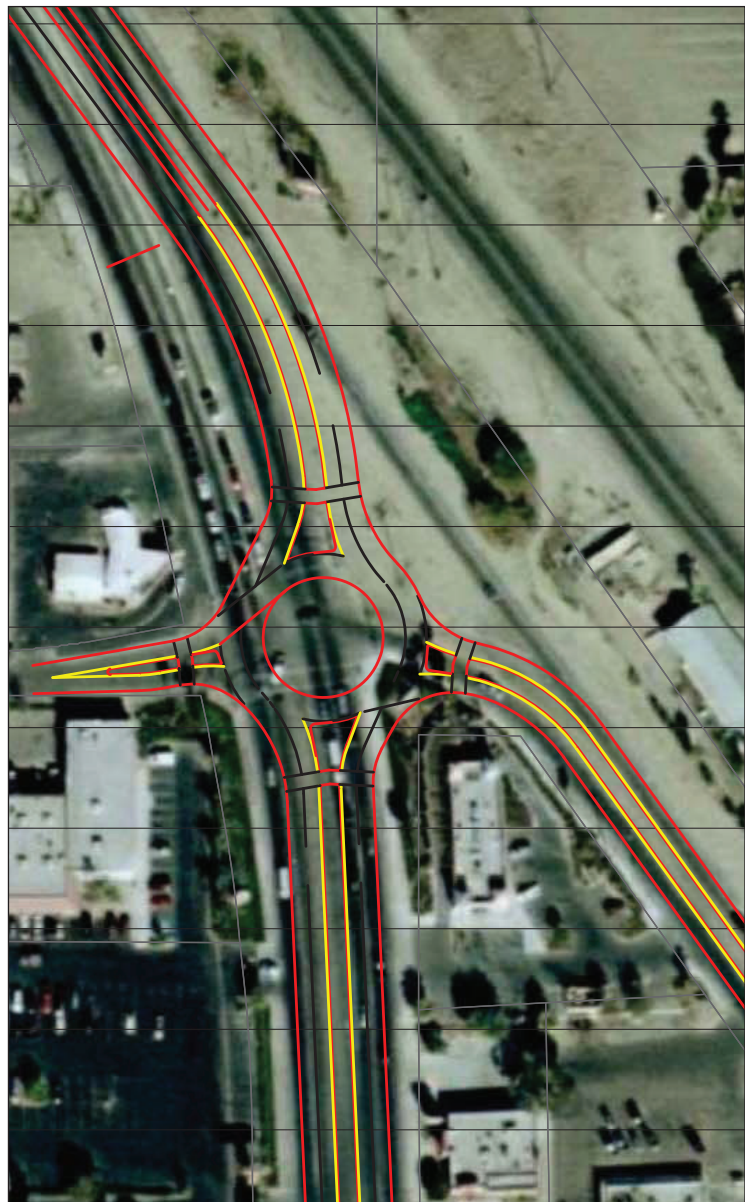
Roundabout design layout at Grapefruit Boulevard/Highway 111 intersection.
